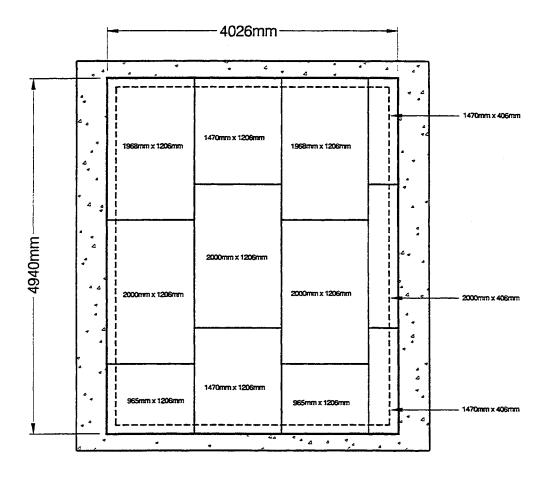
Face layer subfloor layout, joists 500 mm o.c.
